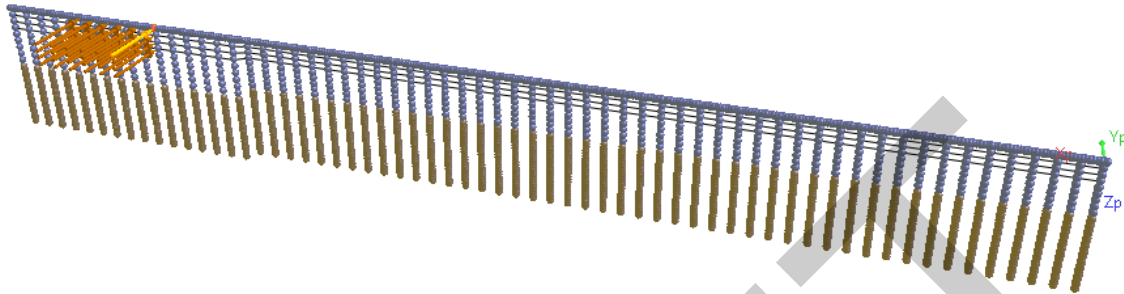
Layout – Load Case 6 (Section 4 – Soil C5)
